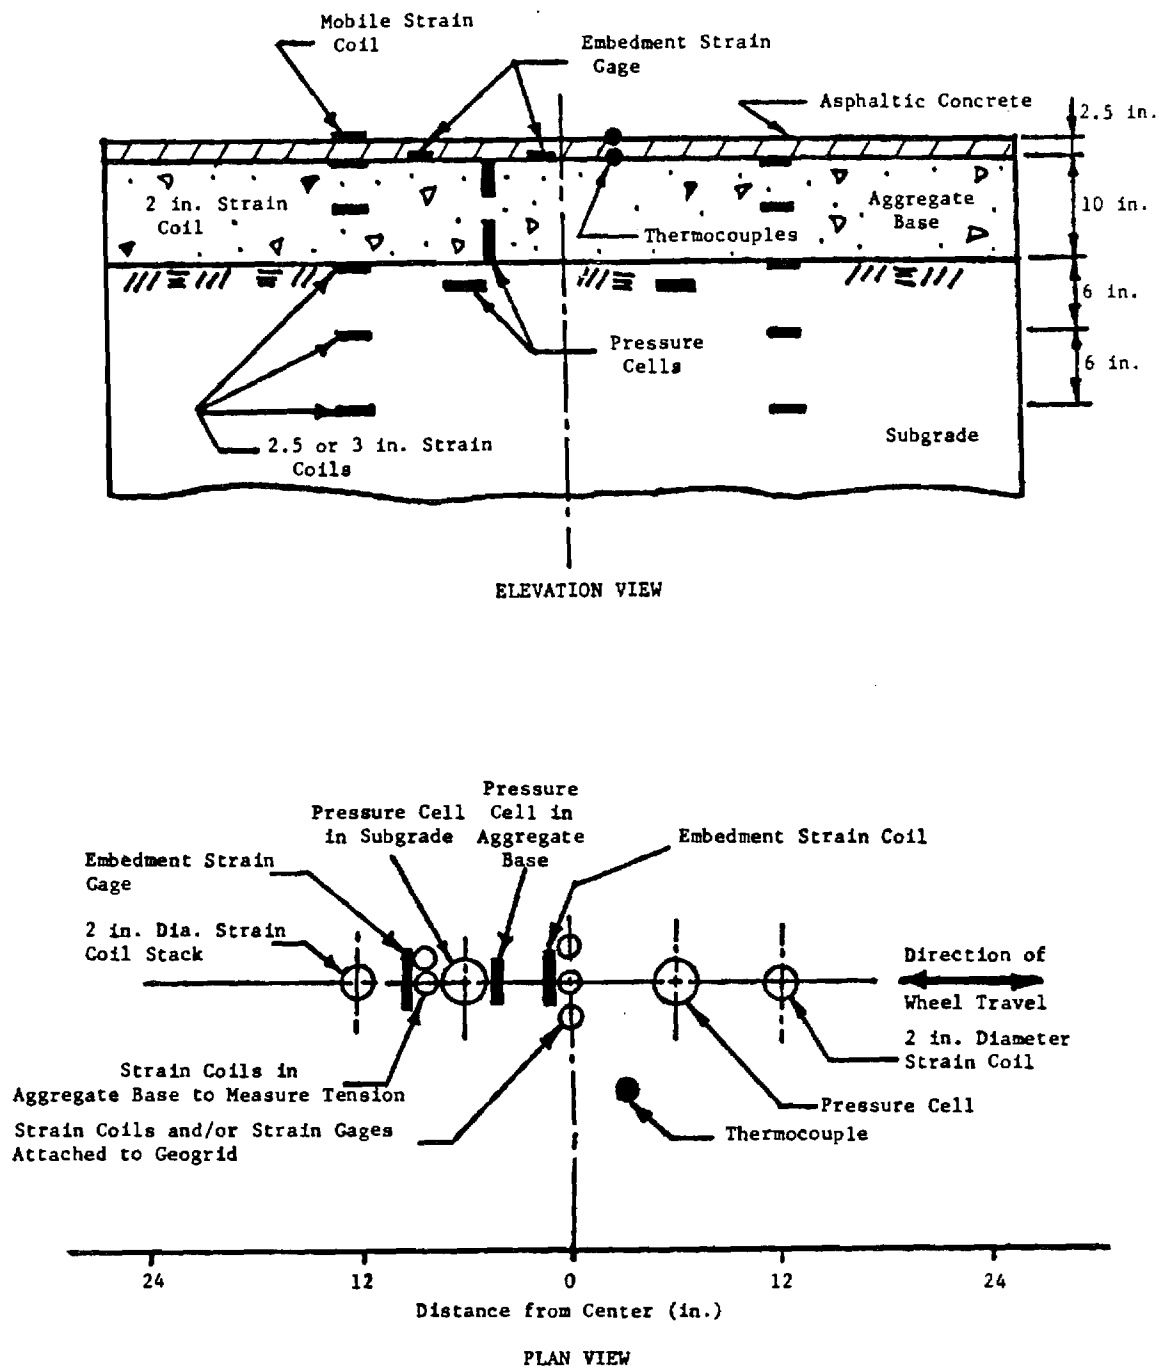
Preliminary Instrument Plan for Each Test Section.
